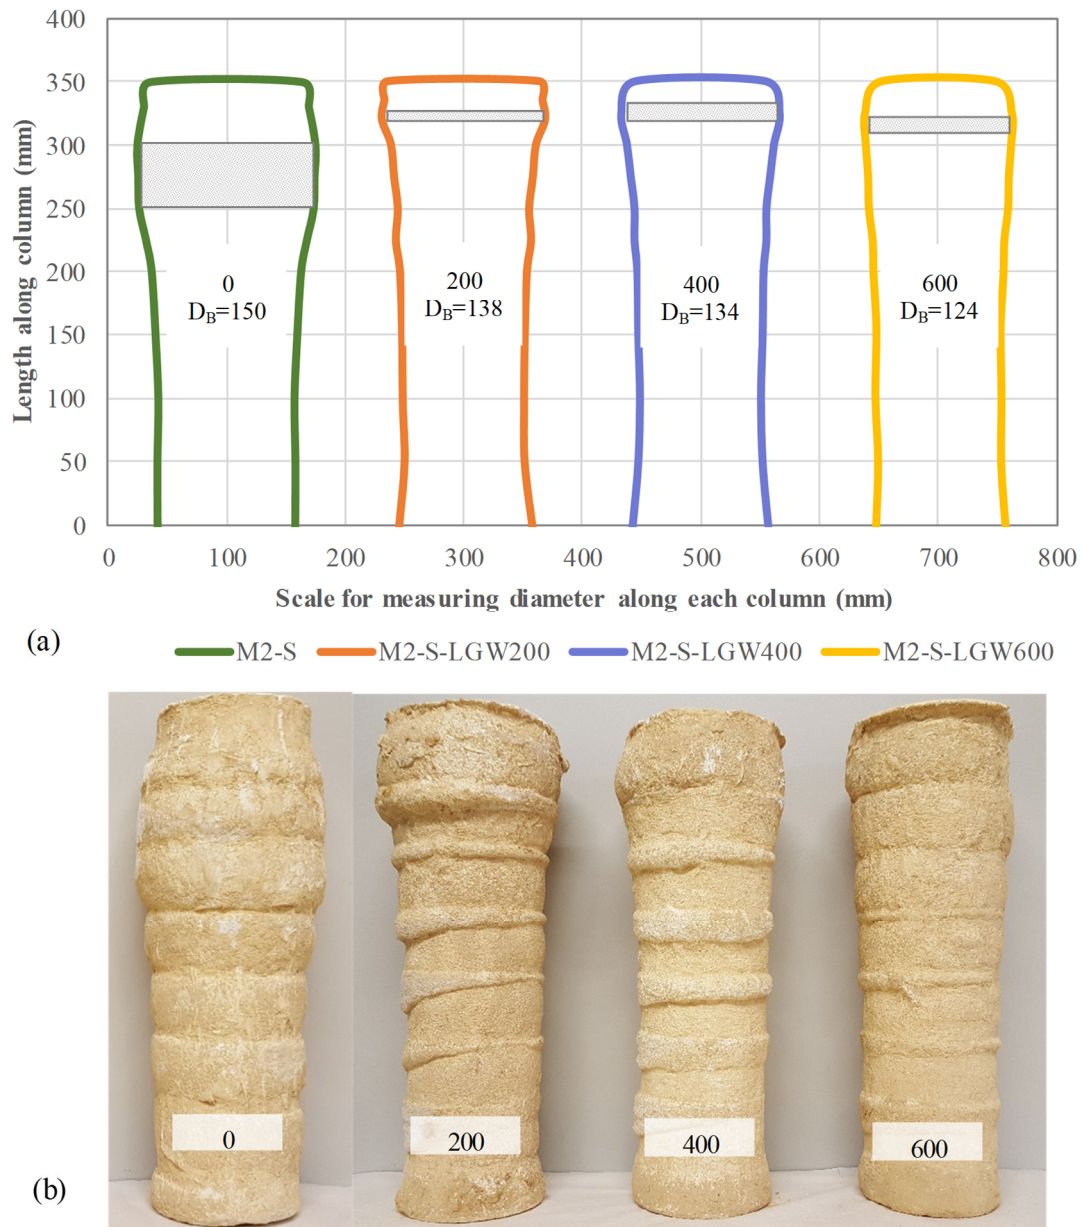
Deformations of tested columns reinforced with layers of Betatex geotextile (GW), and installed in a base silt at LL, (a) graphical plot and (b) pictorial illustration
